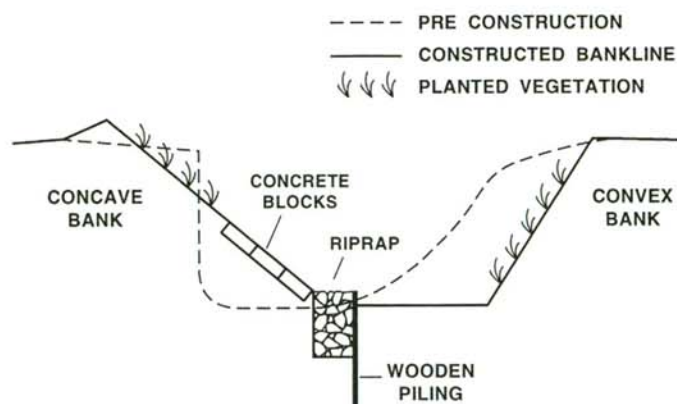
Typical Cross Section (simplified) of Design Involving Vegetation, Bank Shaping, and Structure.
